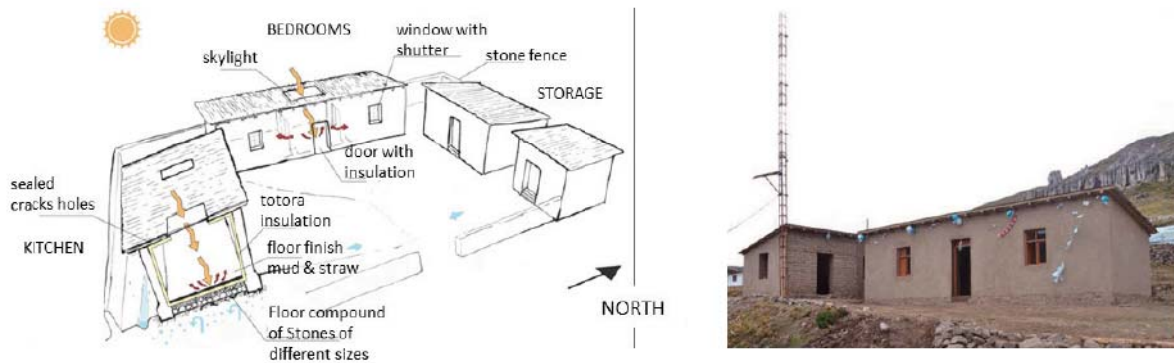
Proposed site plan of prototype and built cabin (bedroom unit and kitchen)
